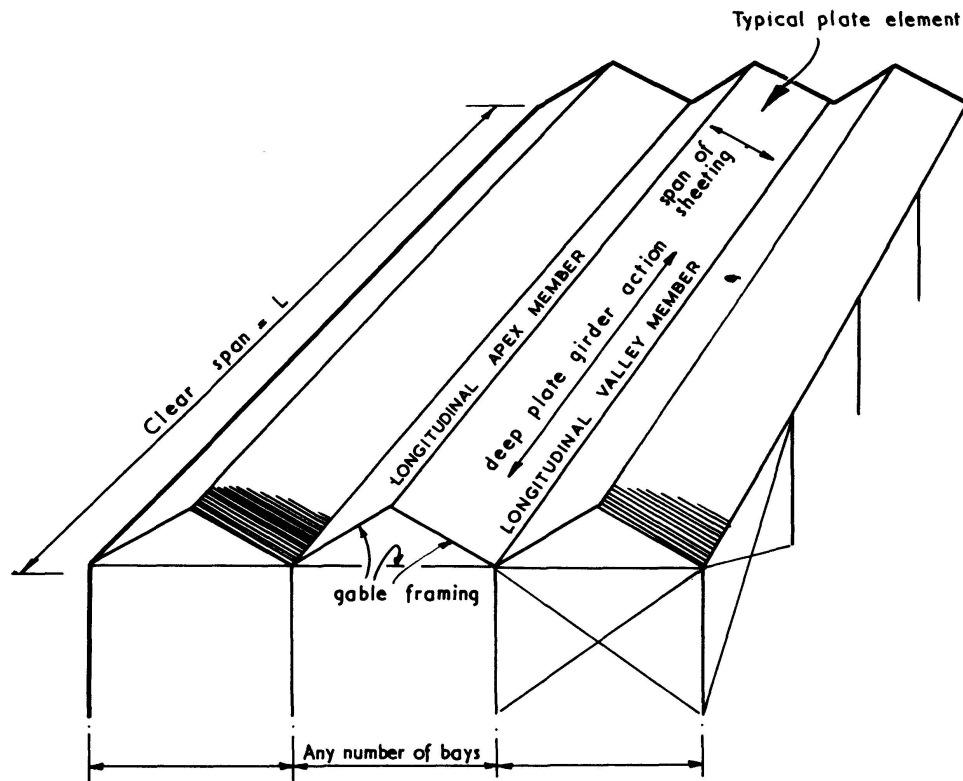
Concept of Light Gauge Folded Plate Roof.
